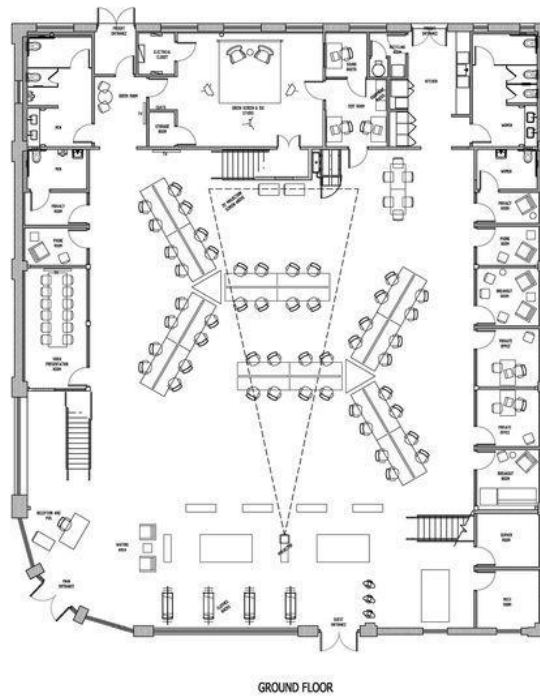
BuzzFeed Ground floor plan (Source: JIDK Architects)
